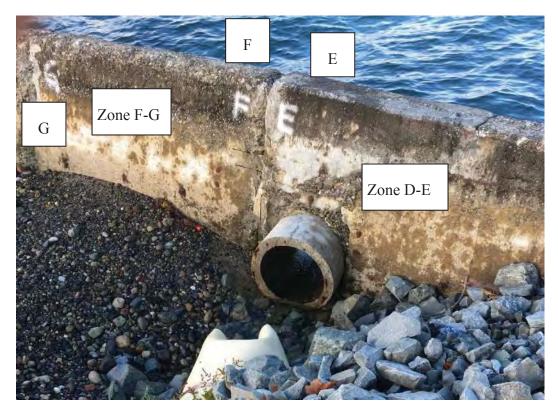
Zones D-E & F-G, Broken Outfall. Source: Reid Middleton Site Visit 10/18/2016
